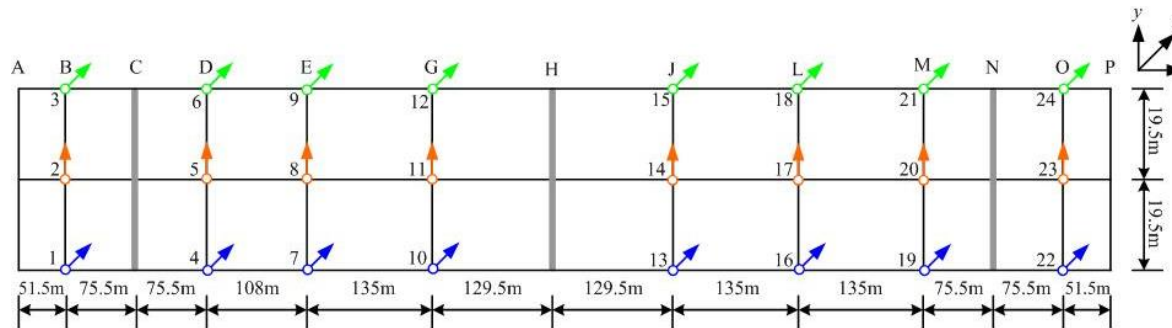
Detailed arrangement of accelerometers on bridge deck
